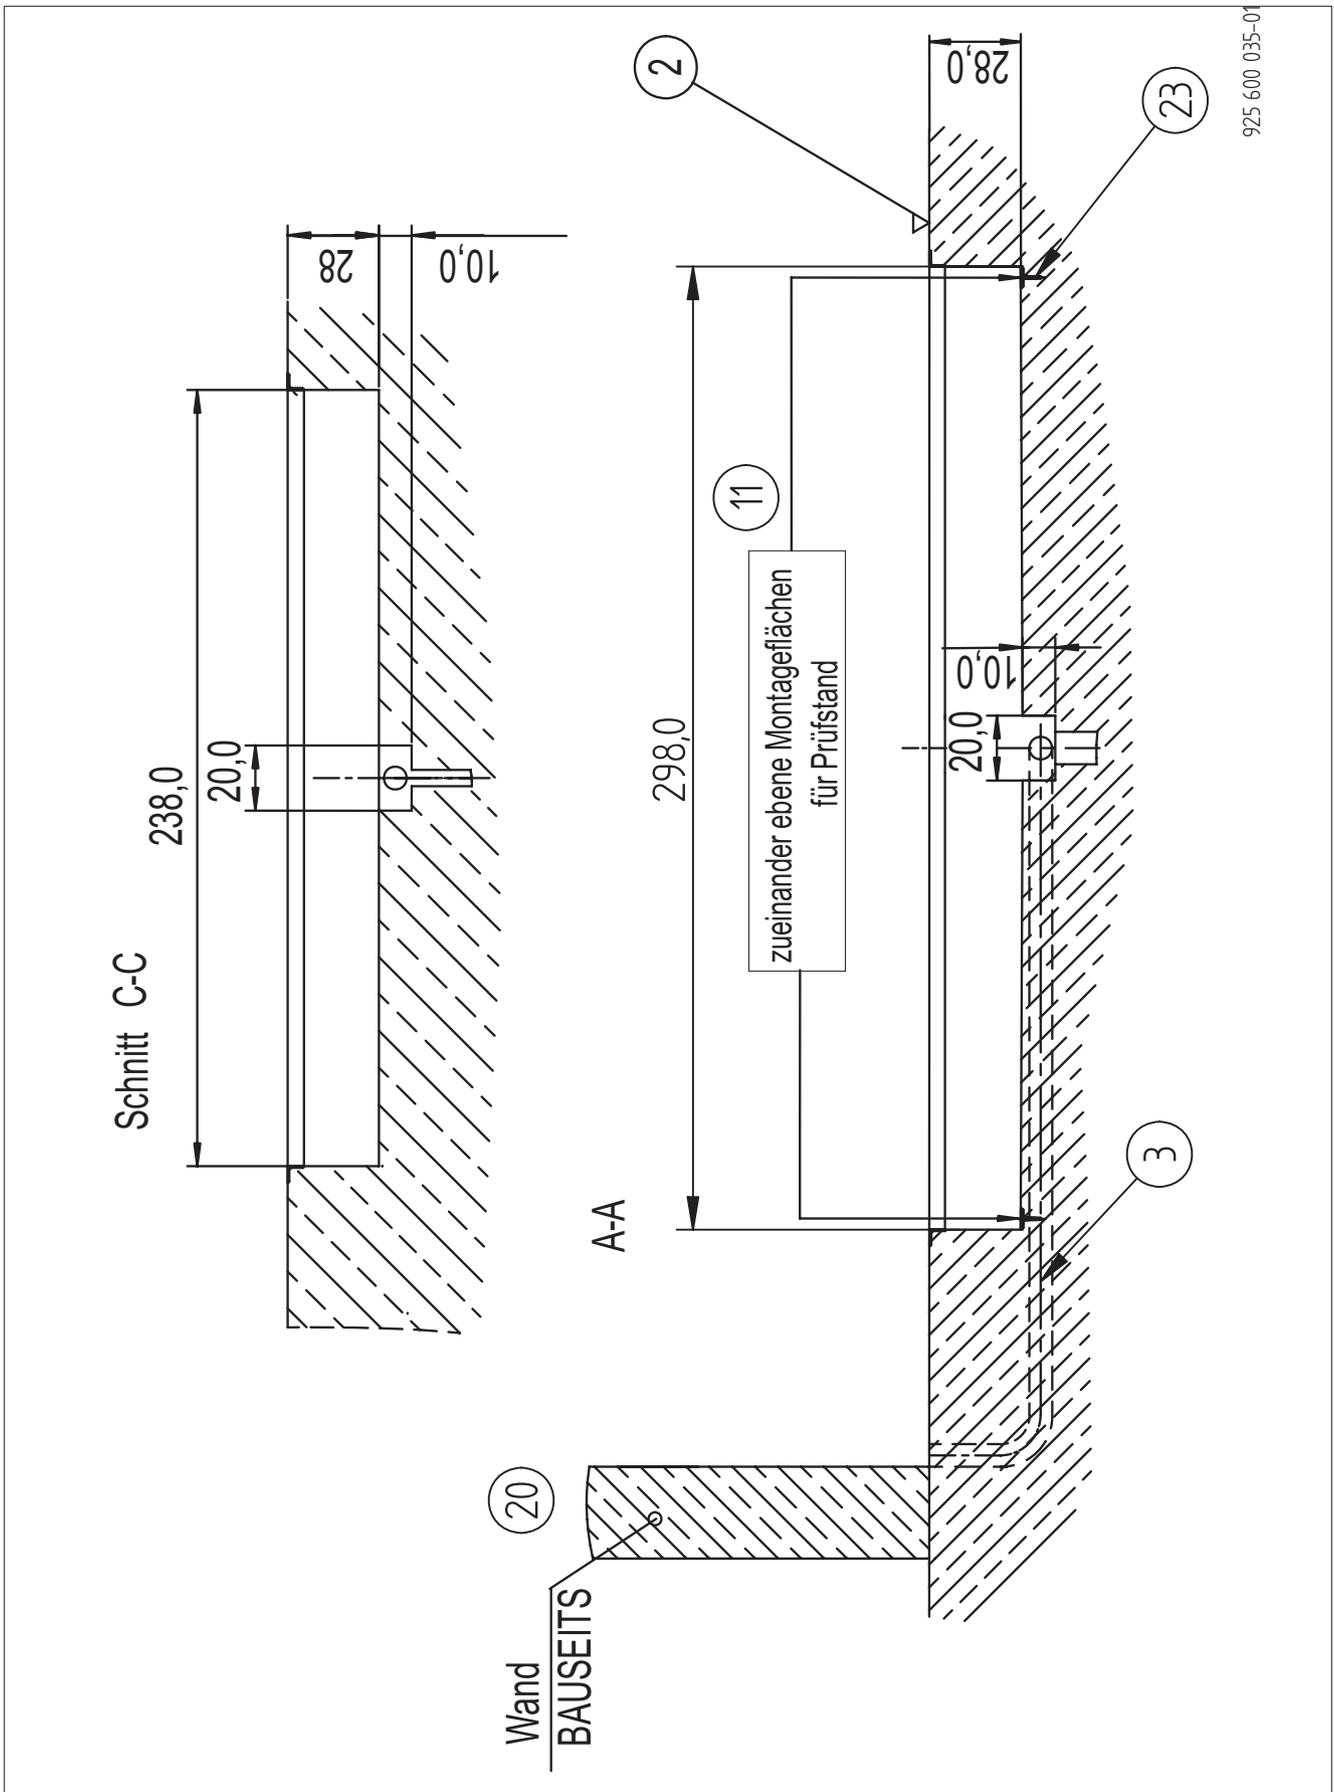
Plan of Pit BD 660 with PC, suspension tester and side slip tester - Sectional view A-A and C-C
